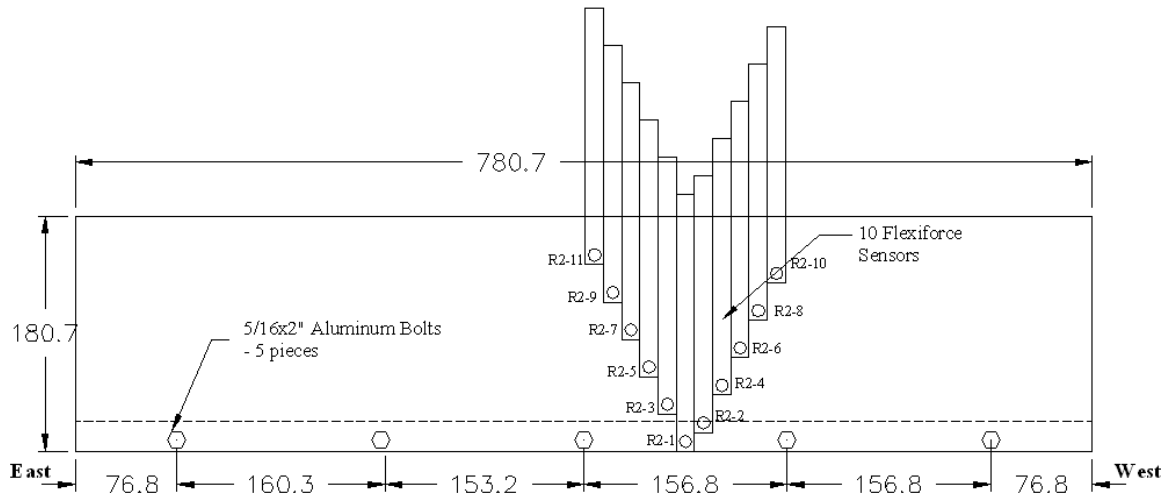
Flexiforce layout on north stiff wall for LAA02 (mm, model scale).
